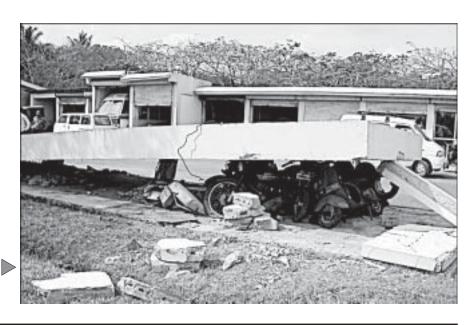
Collapse of three-storey reinforced concrete frame building at Port Blair (Photo: Sudhir K Jain)
